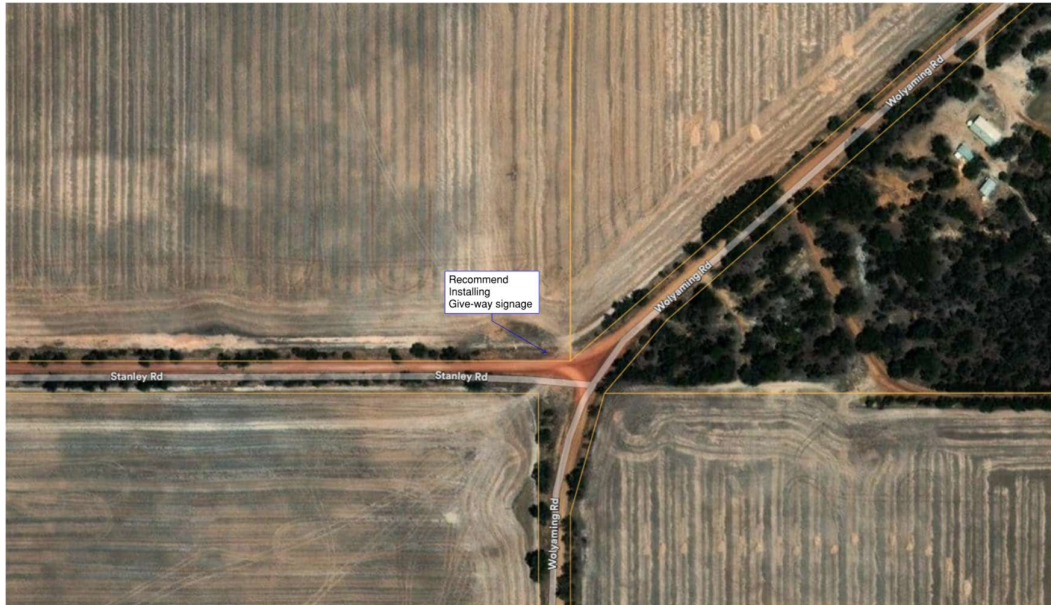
Stanley Road/ Wolyaming Road Intersection
